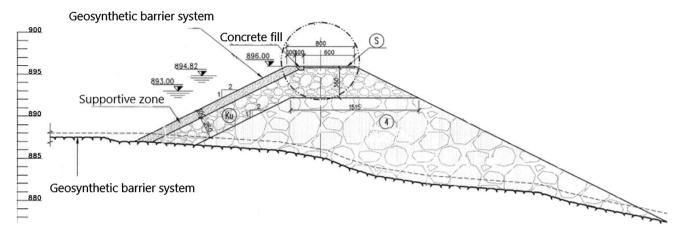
A Typical section of geomembrane-faced rockfill dam in Turkey (DSI 2014)
